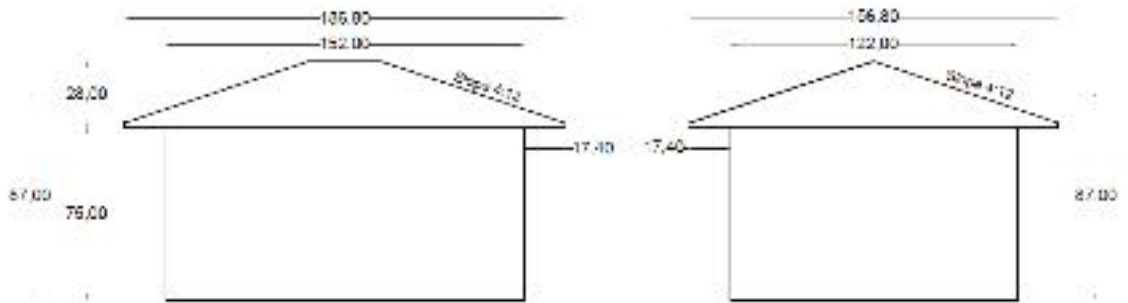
4: Model C layout (a) Elevation View (b) Side View (all dimensions are at model-scale in cm)
